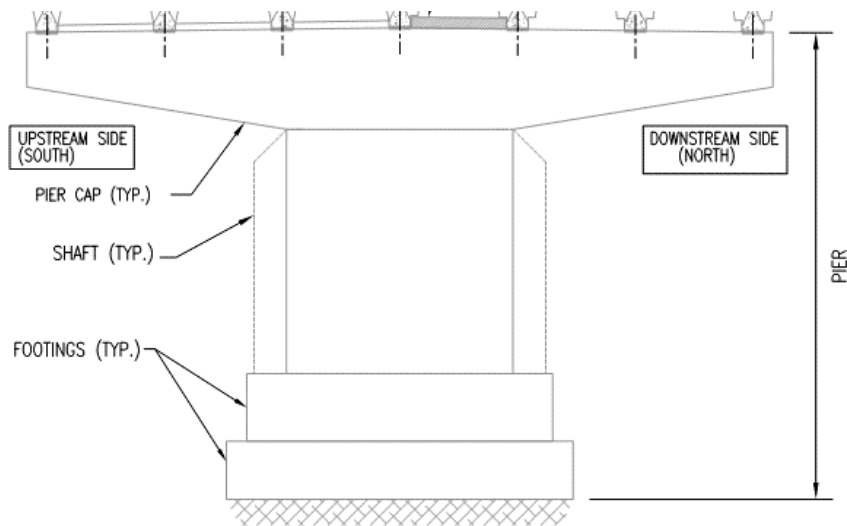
Piers – Section 7 (Source: JCCBI nomenclature plans)
